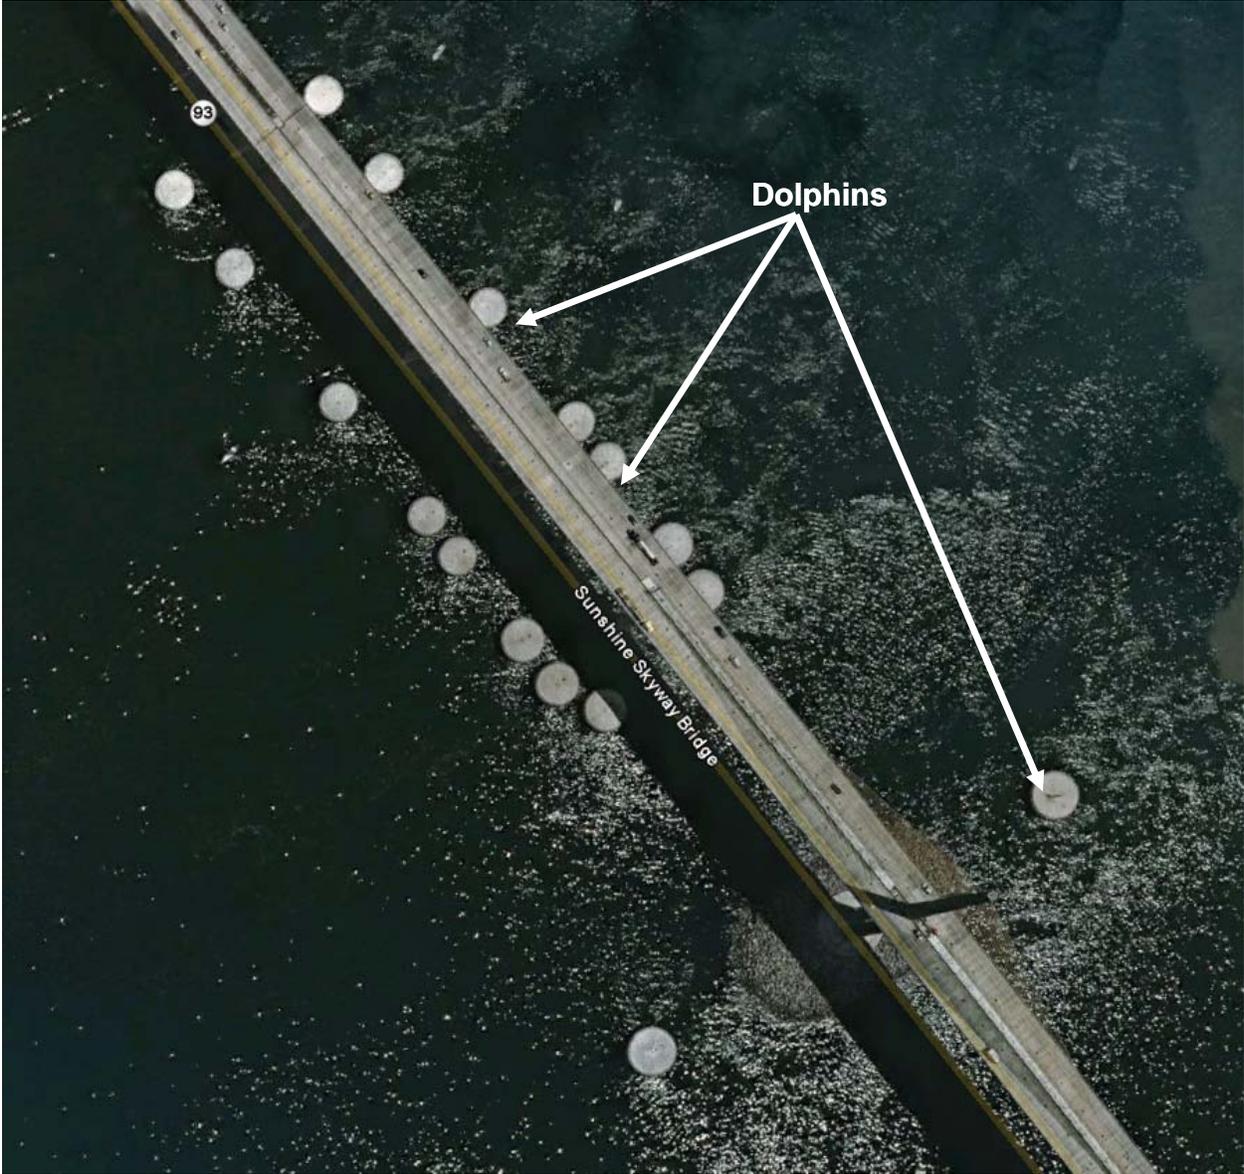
Dolphin Pier Protection at the Sunshine Skyway Bridge
